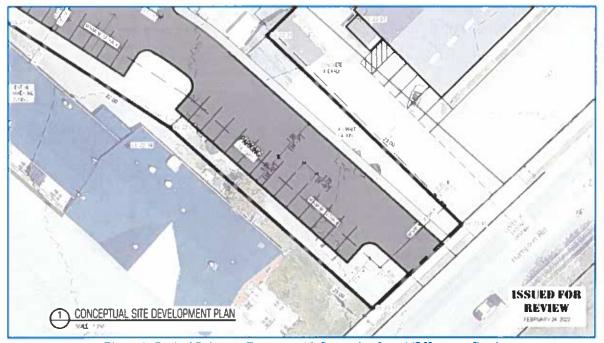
Revised Driveway Entrance with Separation from 147 Hampton Road
